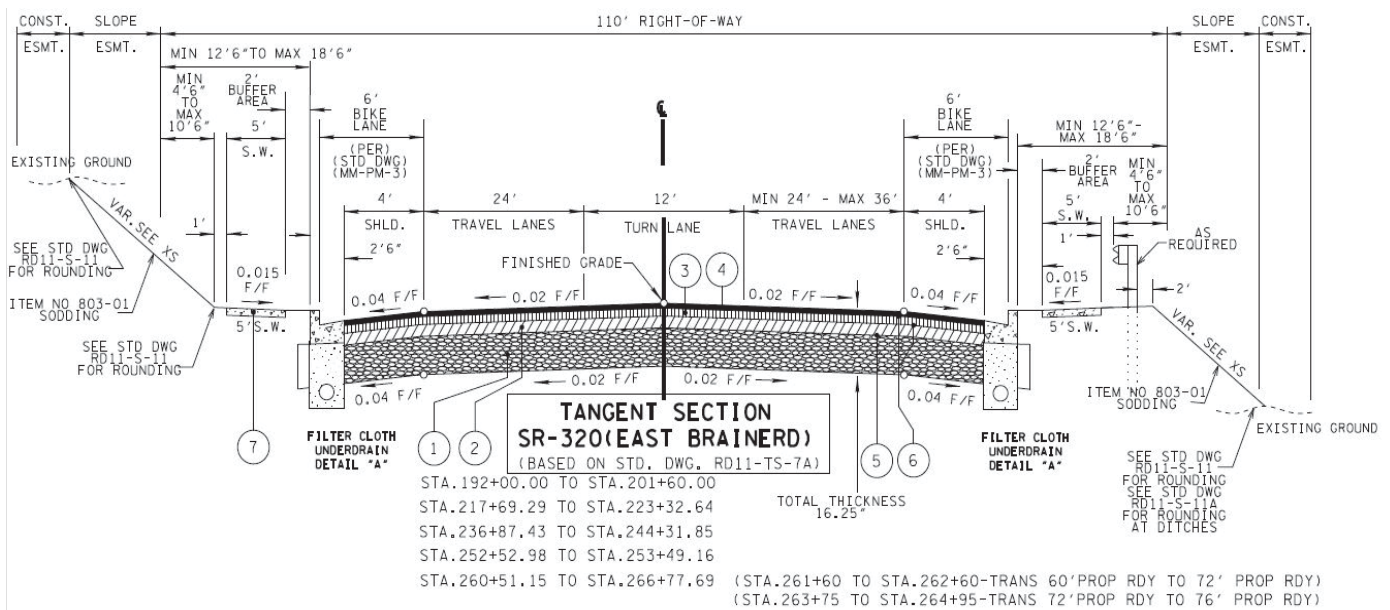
Typical Section of SR-320 to near the intersection with SR-321
